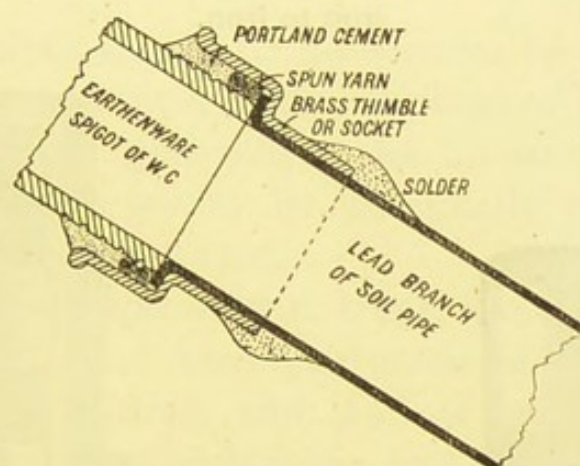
Showing method of connecting stoneware w.c. trap to lead soil pipe.
